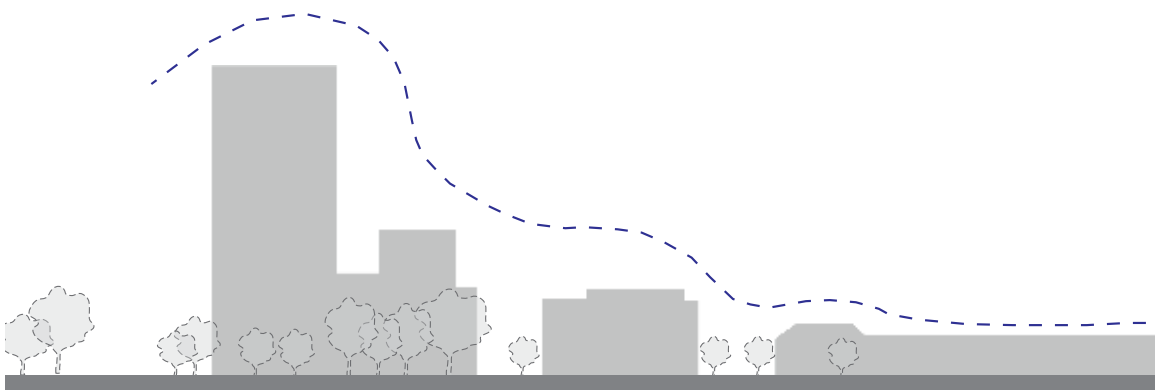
Schematic elevation of Portland Street showing how massing rises incrementally from 2 storey cottages up towards the 20 storey tower.
